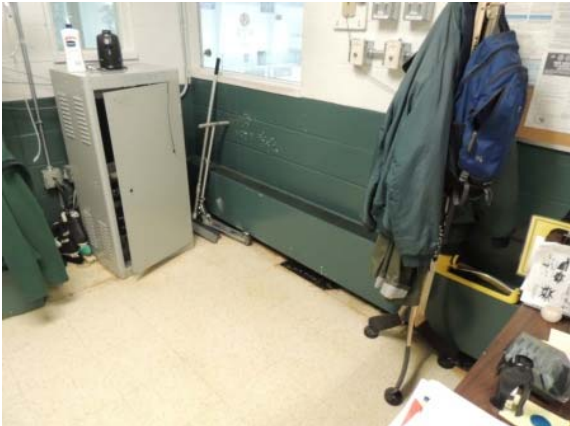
Typical Wall Mounted Hydronic Hot Water Radiant Heater
